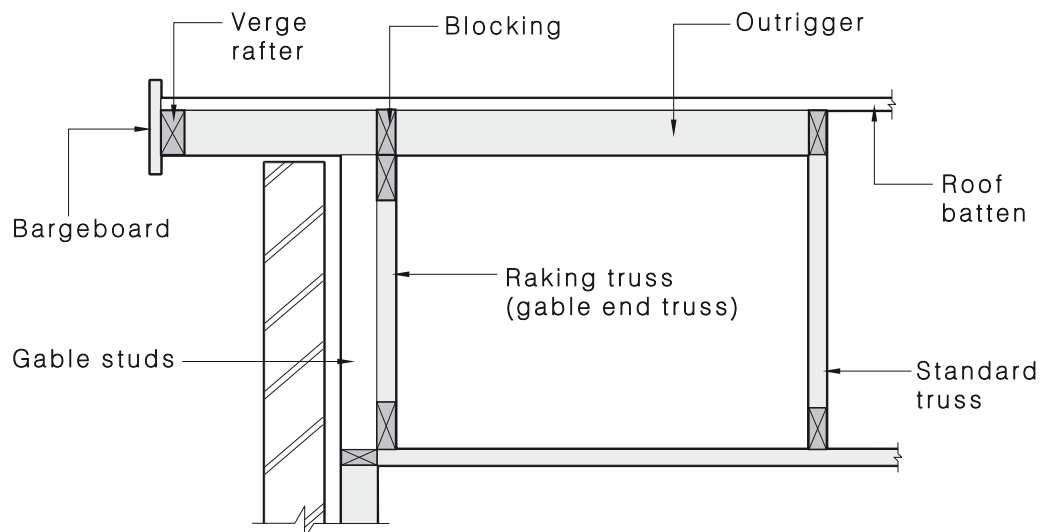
OPEN GABLE OR VERGE—TRUSSED ROOF
